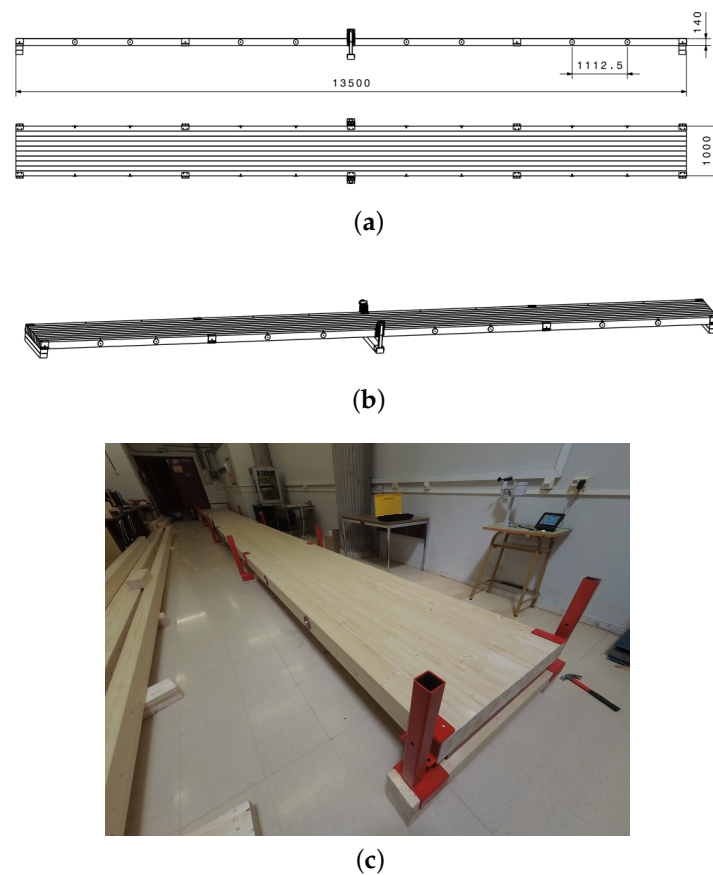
Floor plans, 3D view and picture of the test structure. (a) Elevation and floor plans of the test structure. Dimensions in mm. (b) 3D view of the footbridge. (c) Picture of the test structure.
